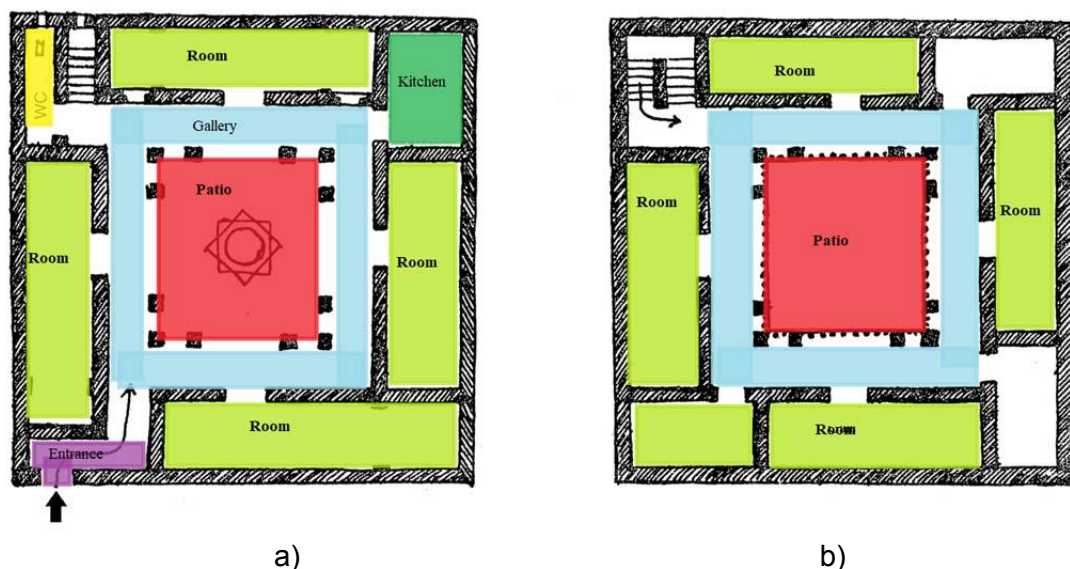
Traditional house plan in Fez, Morocco: a) First floor; b) Second floor. Source: T. Burckhardt
